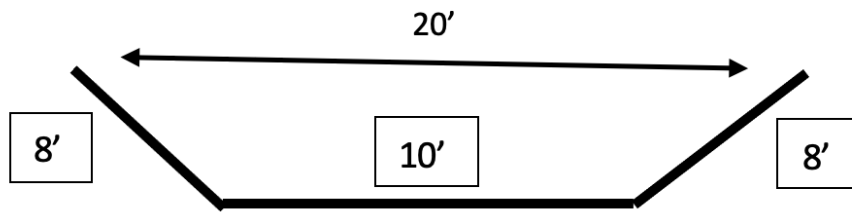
Sketch of curb extension for Ousel Falls Road.
